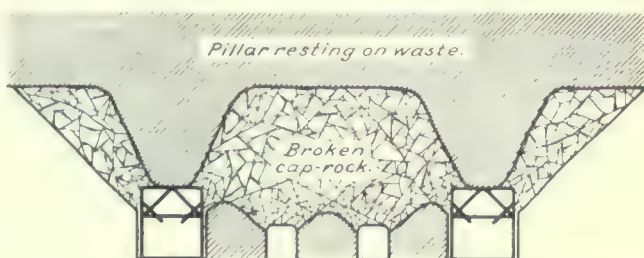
SECTION THROUGH PILLAR-DRIFTS AFTER DRAWING.
